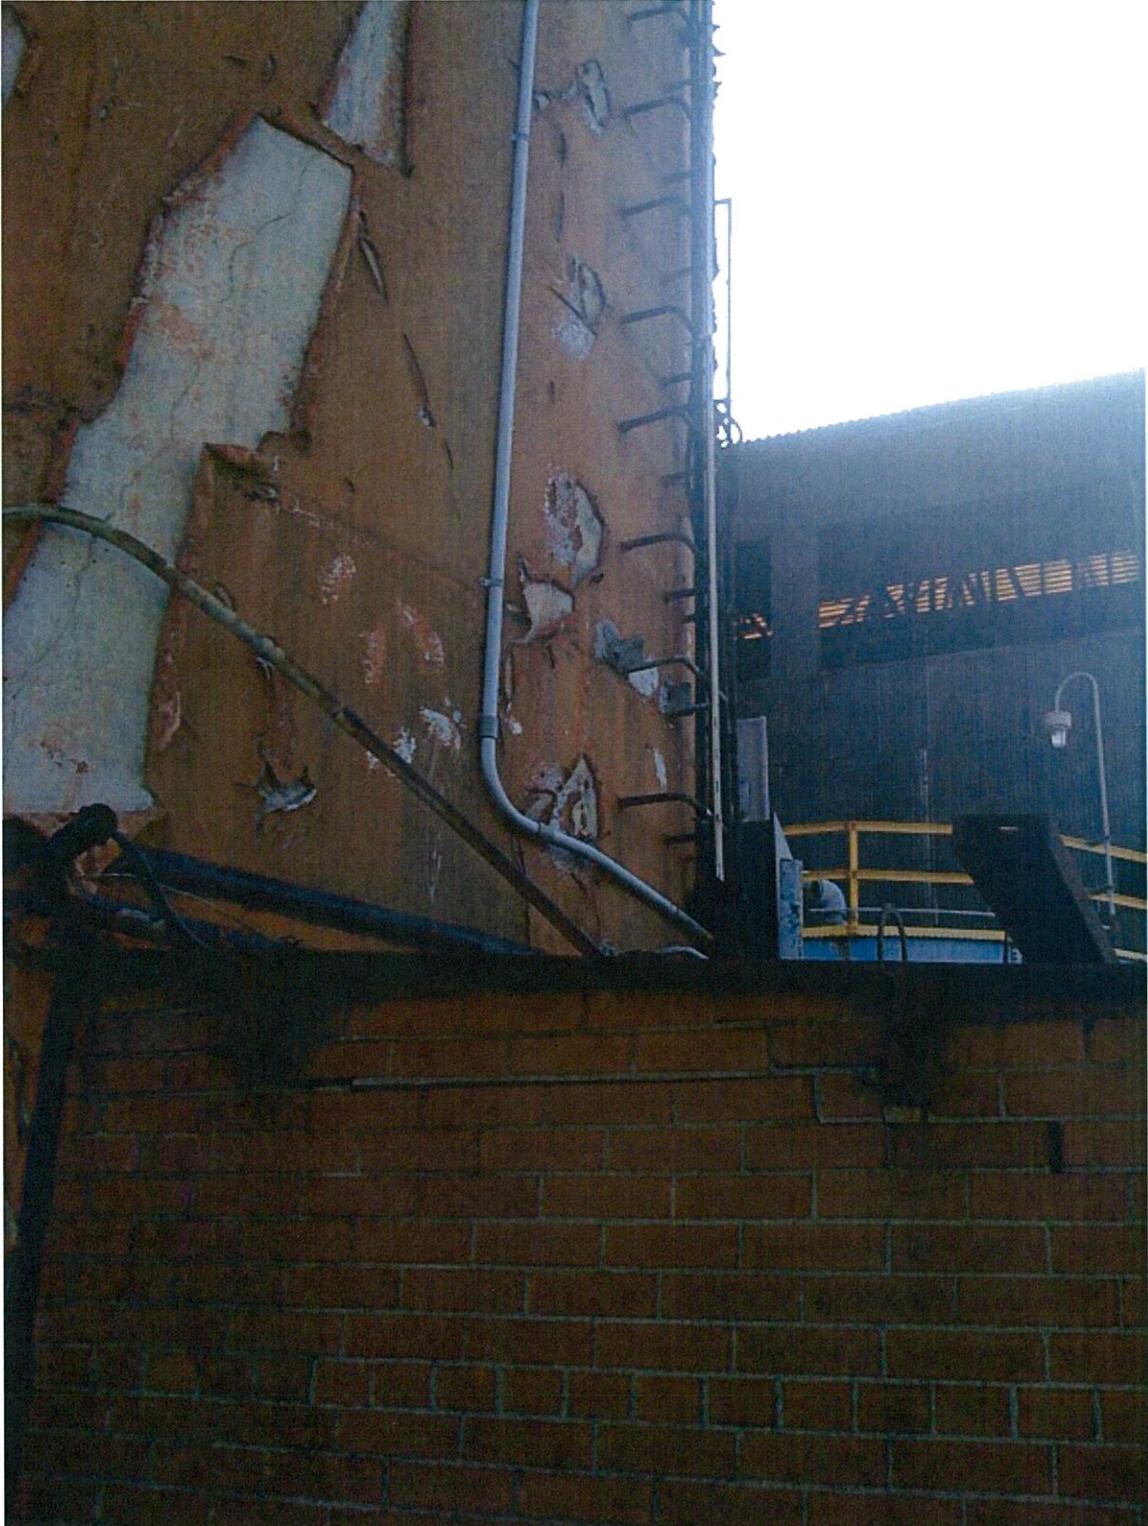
View of Vertical Ladder at South Elevation of Smoke Stack
